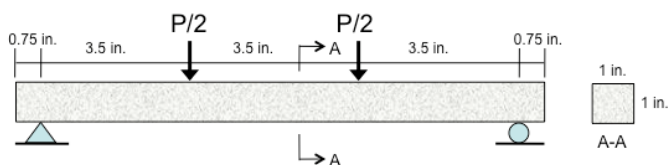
Beam Specimens (1 in. = 25.4 mm)
